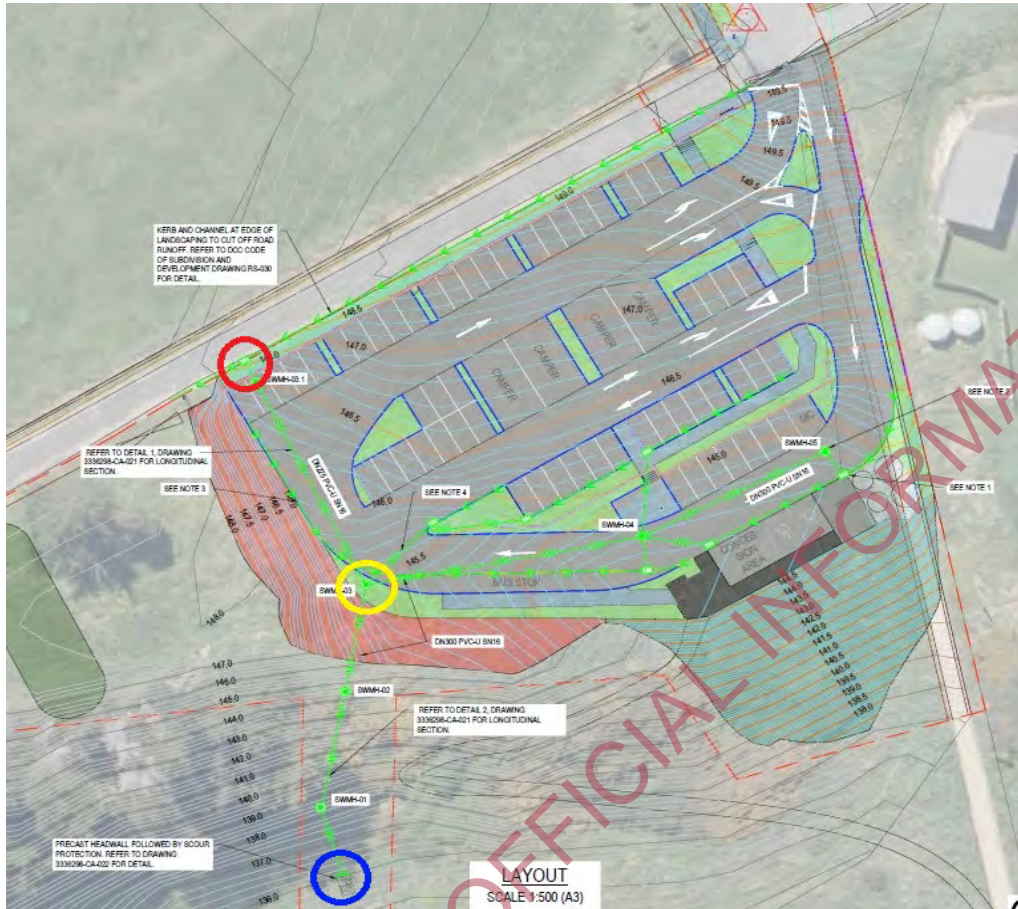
Civil design for stormwater at Tunnel Beach Carpark
